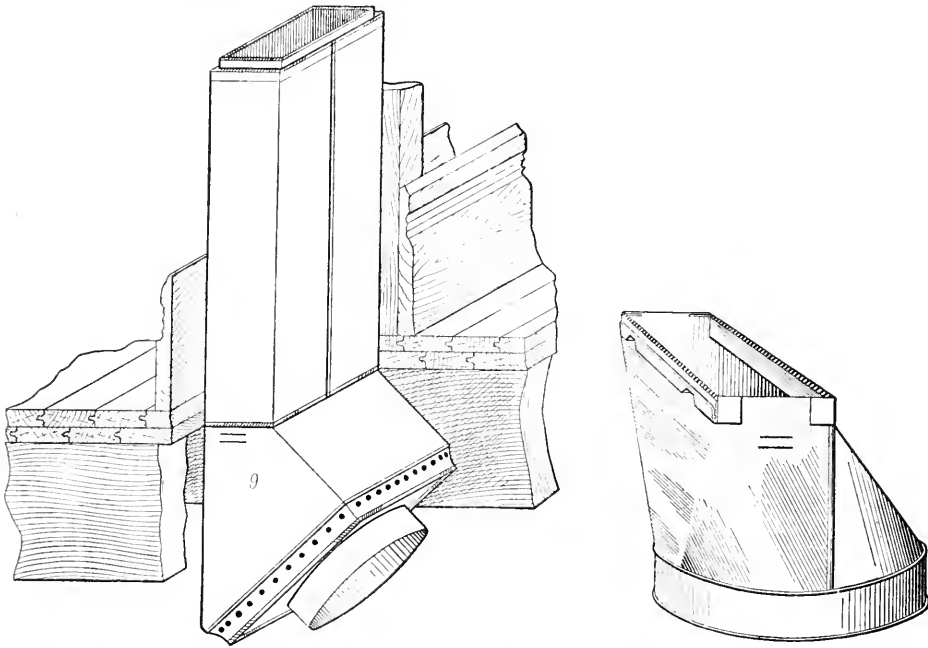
STACK SECTION AND BOOT DOUBLE WALL PIPE.
